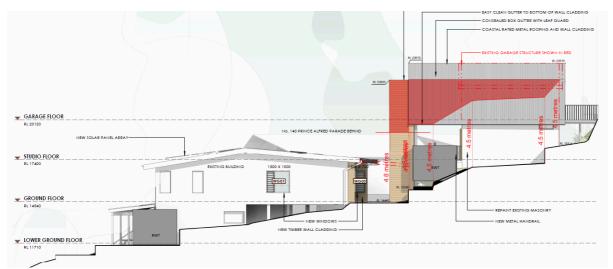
Initial Plans - Building Envelope encroachment (shaded red).
